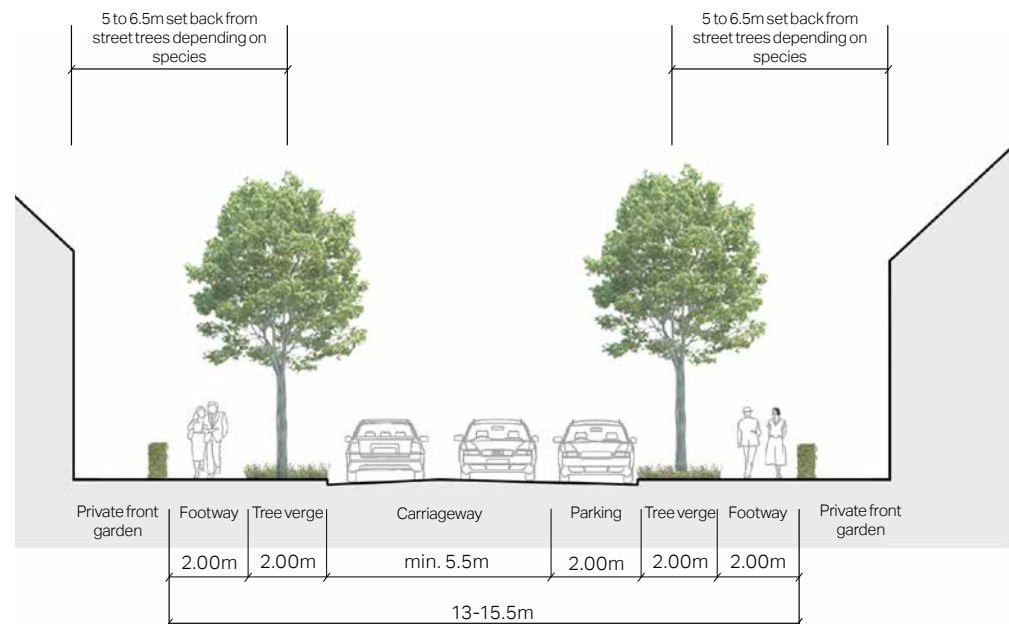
Cross-section to illustrate some guidelines for secondary streets.
